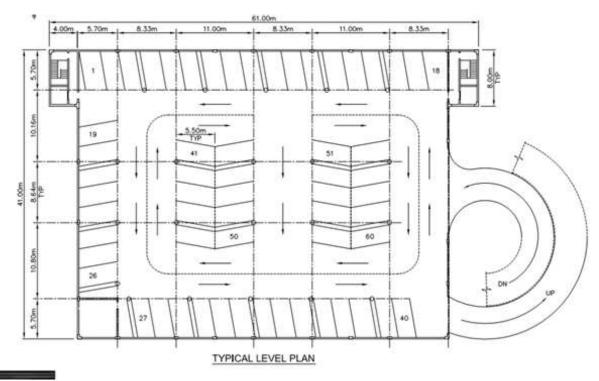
Typical Level Plan for Potential Parking Structure for the 14th Street Site
